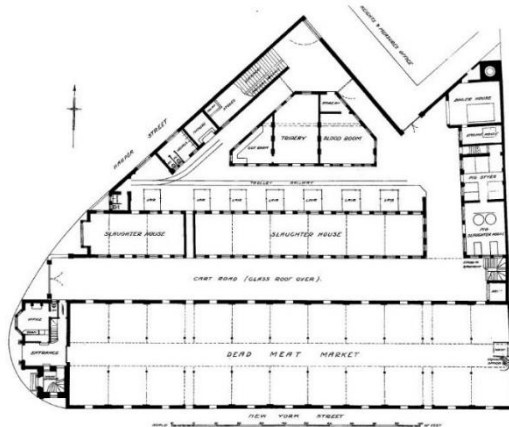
LEEDS. FIRST FLOOR PLAN.
